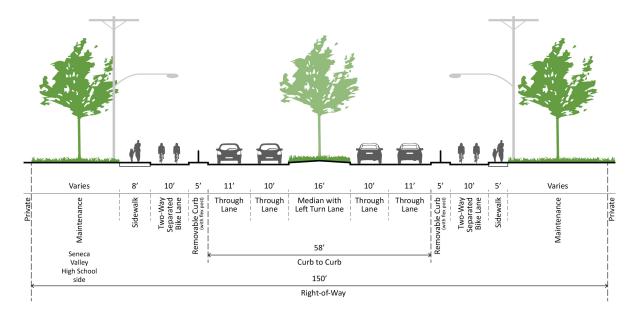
Proposed Typical Street Section for Middlebrook Road Mid-Term
